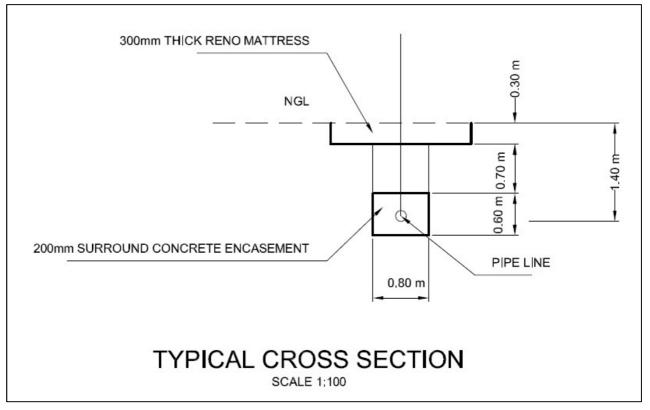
Typical cross section for watercourse crossing No. 5 (Drainage line: 29°03'34.10"S; 29°47'15.69"E)
